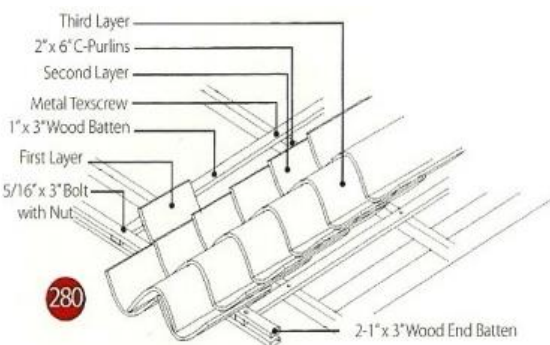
Detail of Clay Tile Roof with G.I. Sheet Ceiling.
